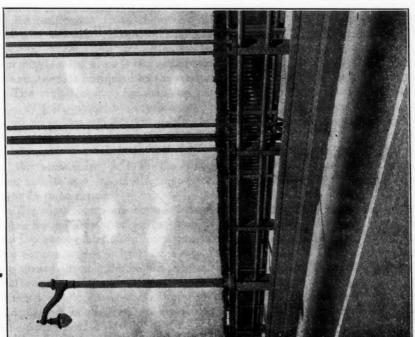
VIEW OF DECK, GEORGE WASHINGTON BRIDGE.
